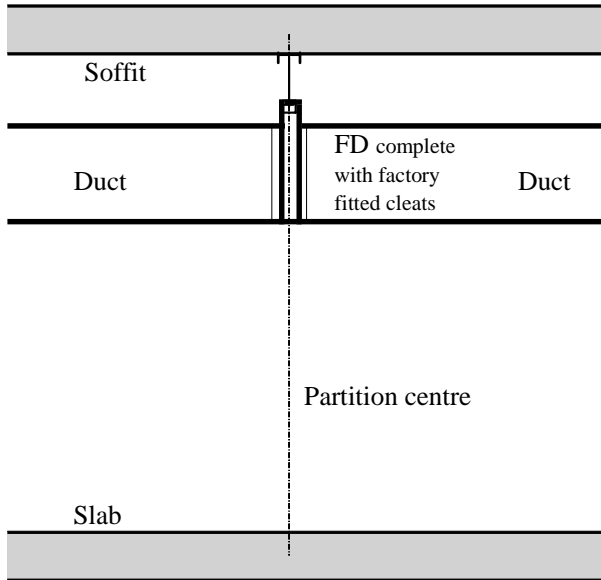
Elevation with support, damper (incl support cleat) and duct (including breakaway duct joints) fitted to suit the head channel (or its centre line)
